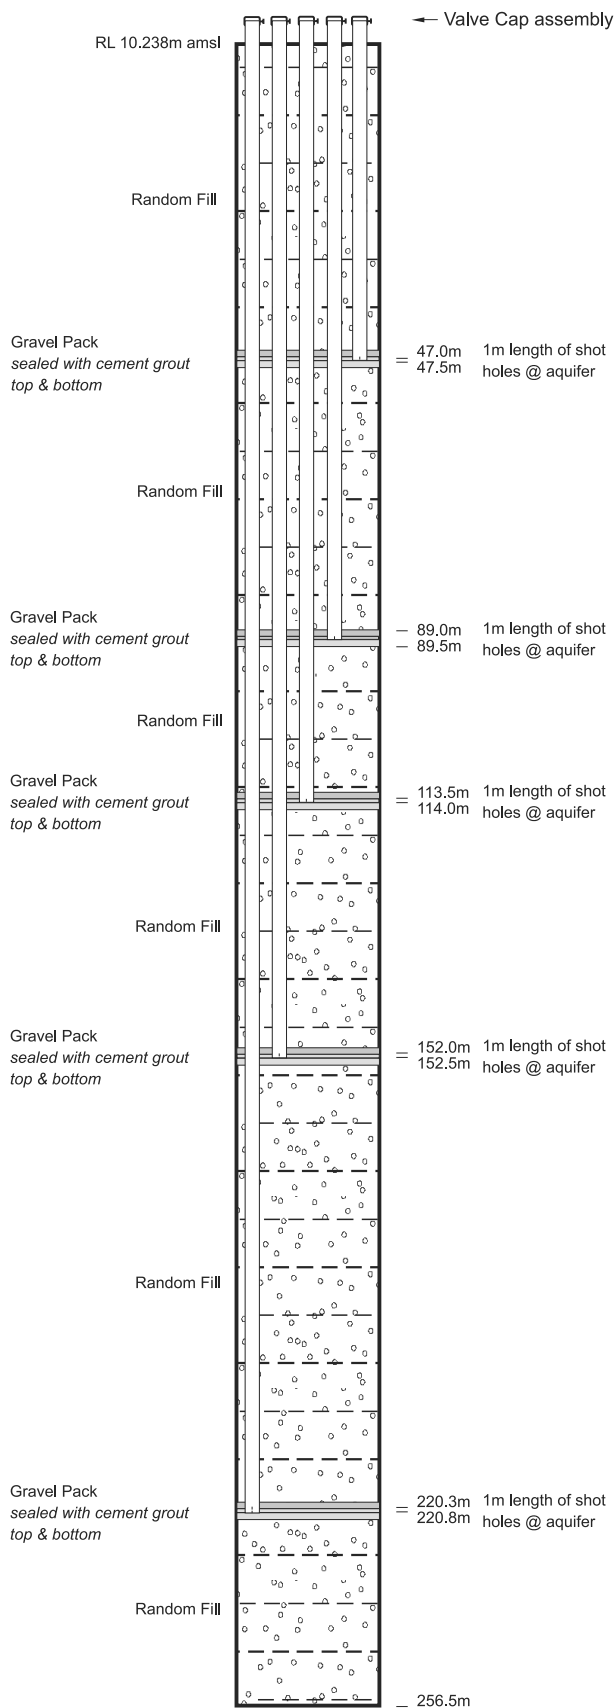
Tollemache Orchard testbore piezometer construction details.
